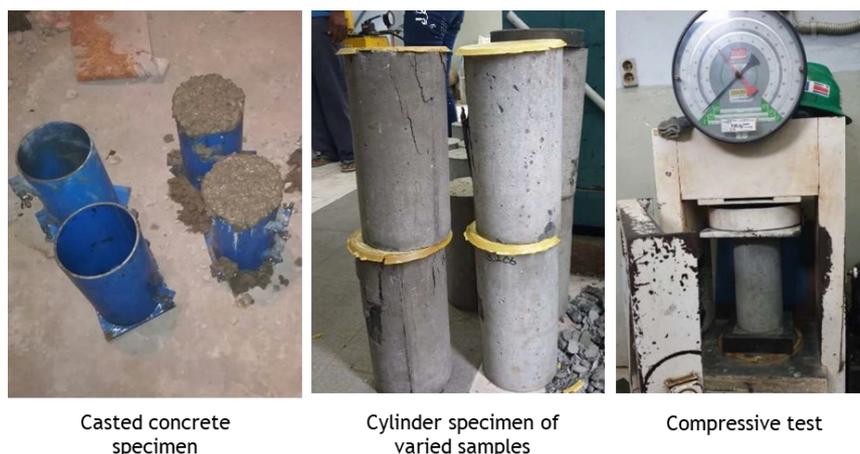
Concrete specimen; casting, specimen preparation and testing scheme
